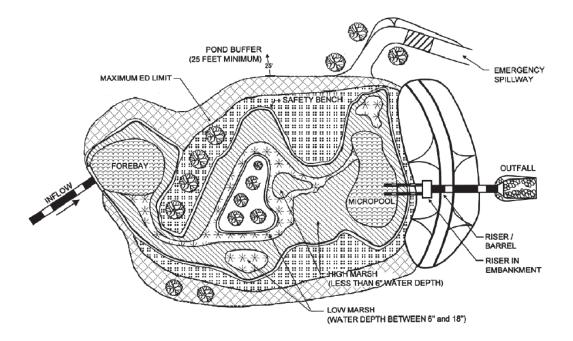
Plan View of Hydrologic Zones around Stormwater Wet ED Pond
